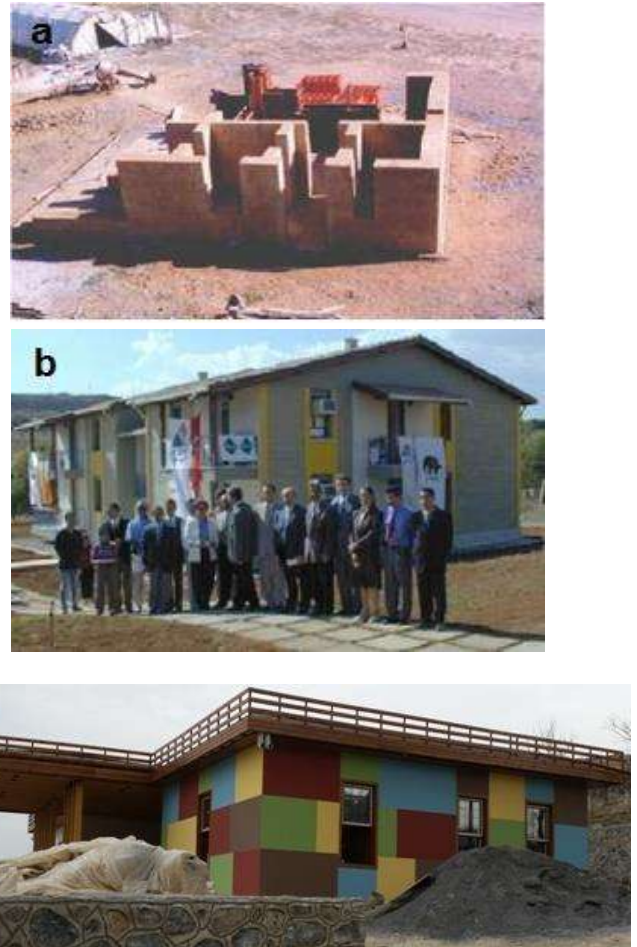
a) Construction of Alker Building, b) Urfa Pilot Building, c) Building constructed in Malatya
